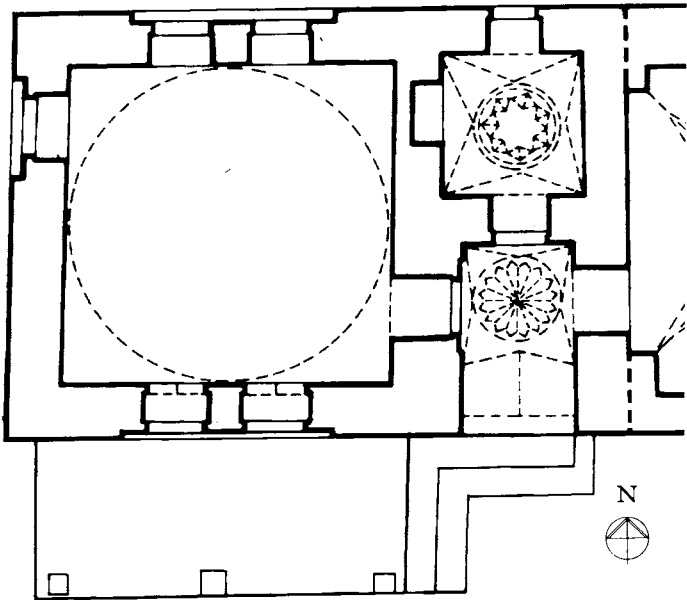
Khalwat Parwiz, ground-floor plan.
